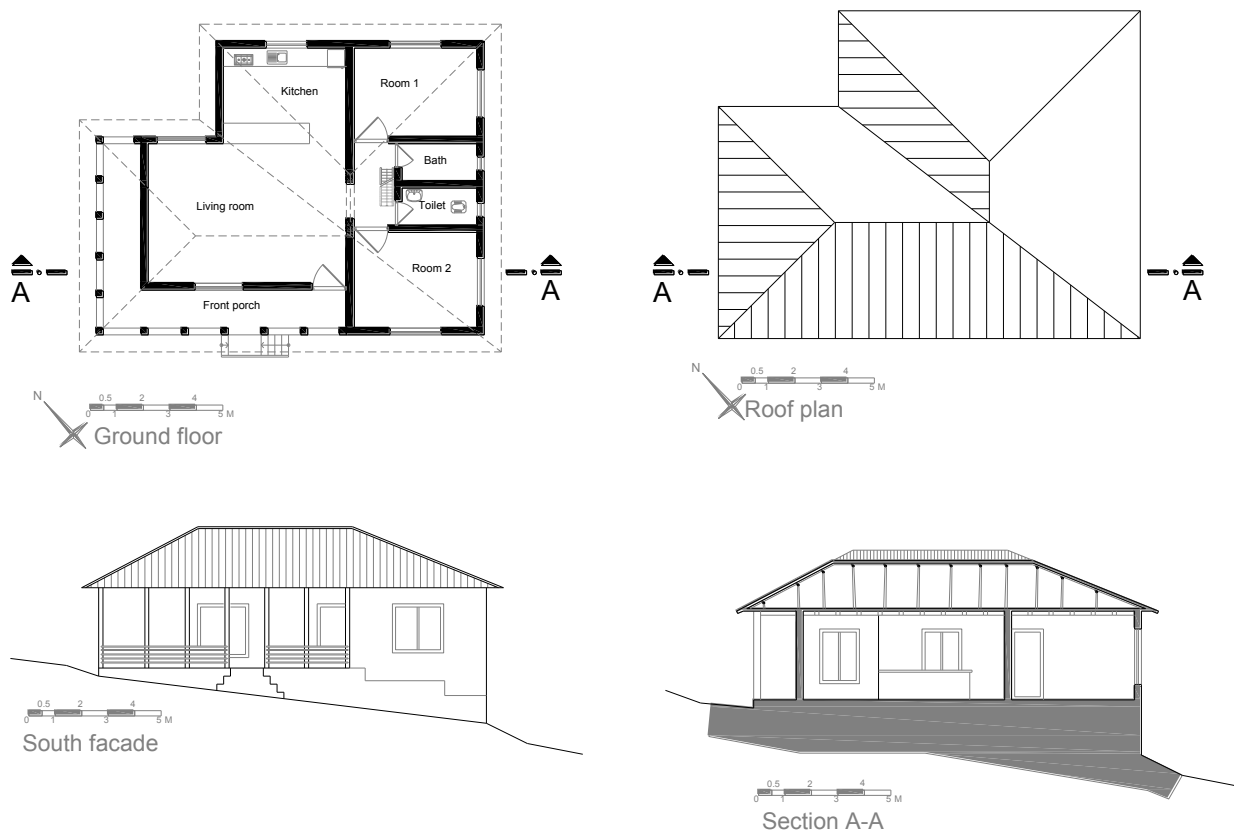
Plans, elevation and section of designed new house in Perija.
